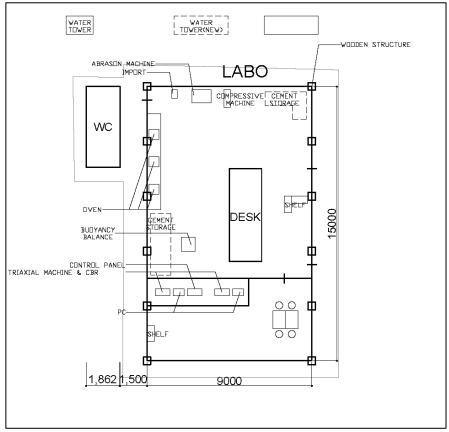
DRRD Research and Testing Laboratory Layout Drawing
